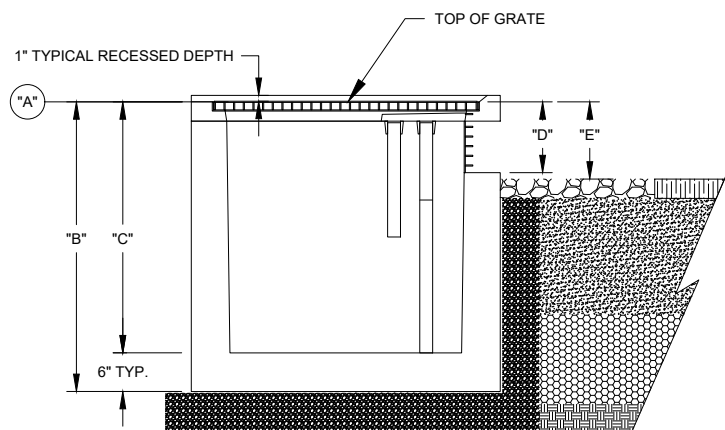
, PAVEMENT TIP DOWN & CURB CUT'S INLET FLOW
